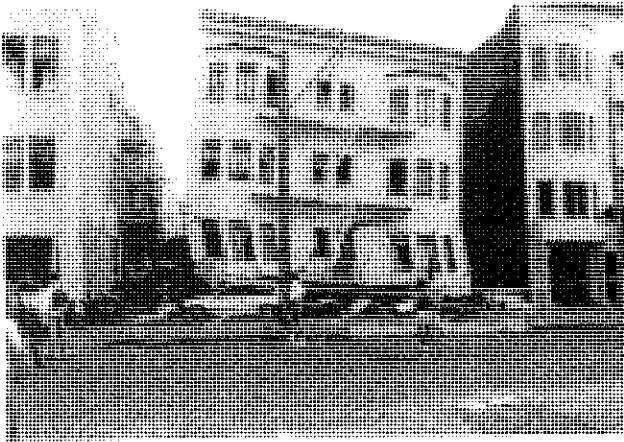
A collapsed San Francisco, California apartment building. Because of the extent of damage at the first floor, the building is considered an *unstable* Unsafe structure, and entry is not allowed.
